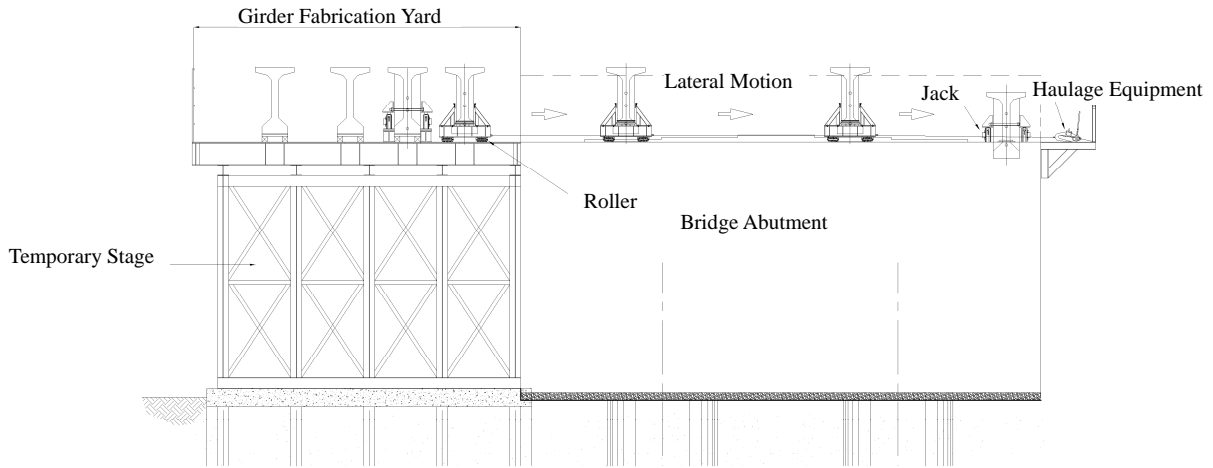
Temporary Steel Stage for Girder Manufacture and Procedure of Girder Erection
